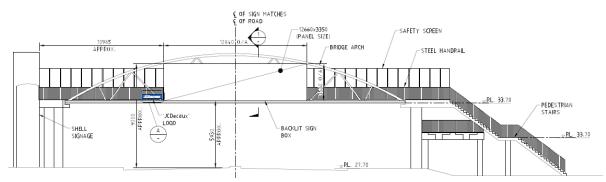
Elevation Plan A - Facing Westbound Traffic
